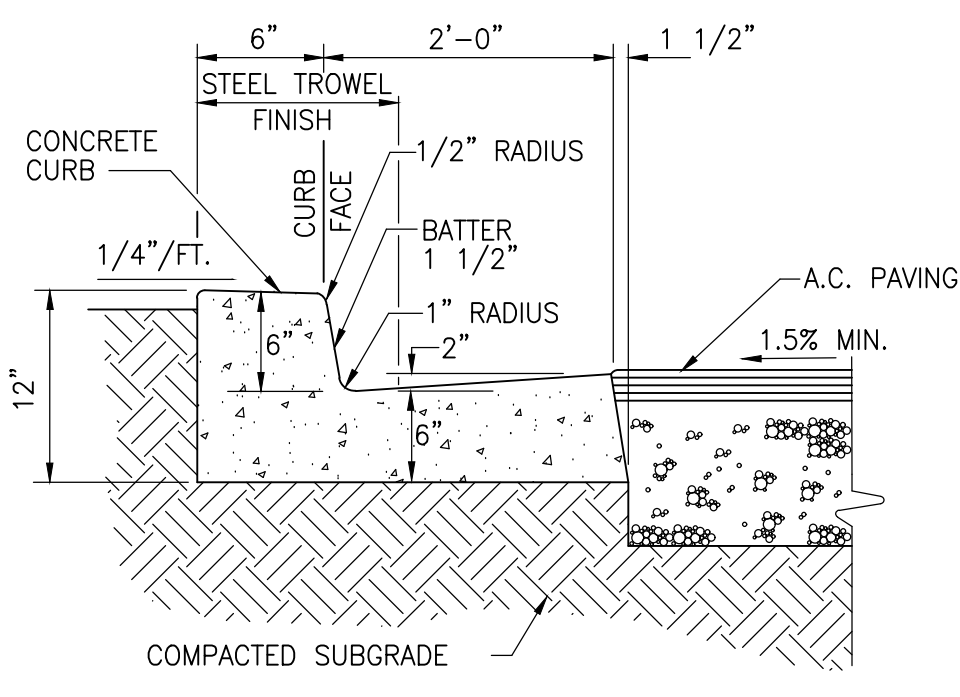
PROPOSED COLIMA ROAD PUBLIC STREET TYPICAL SECTION "G" STREET
